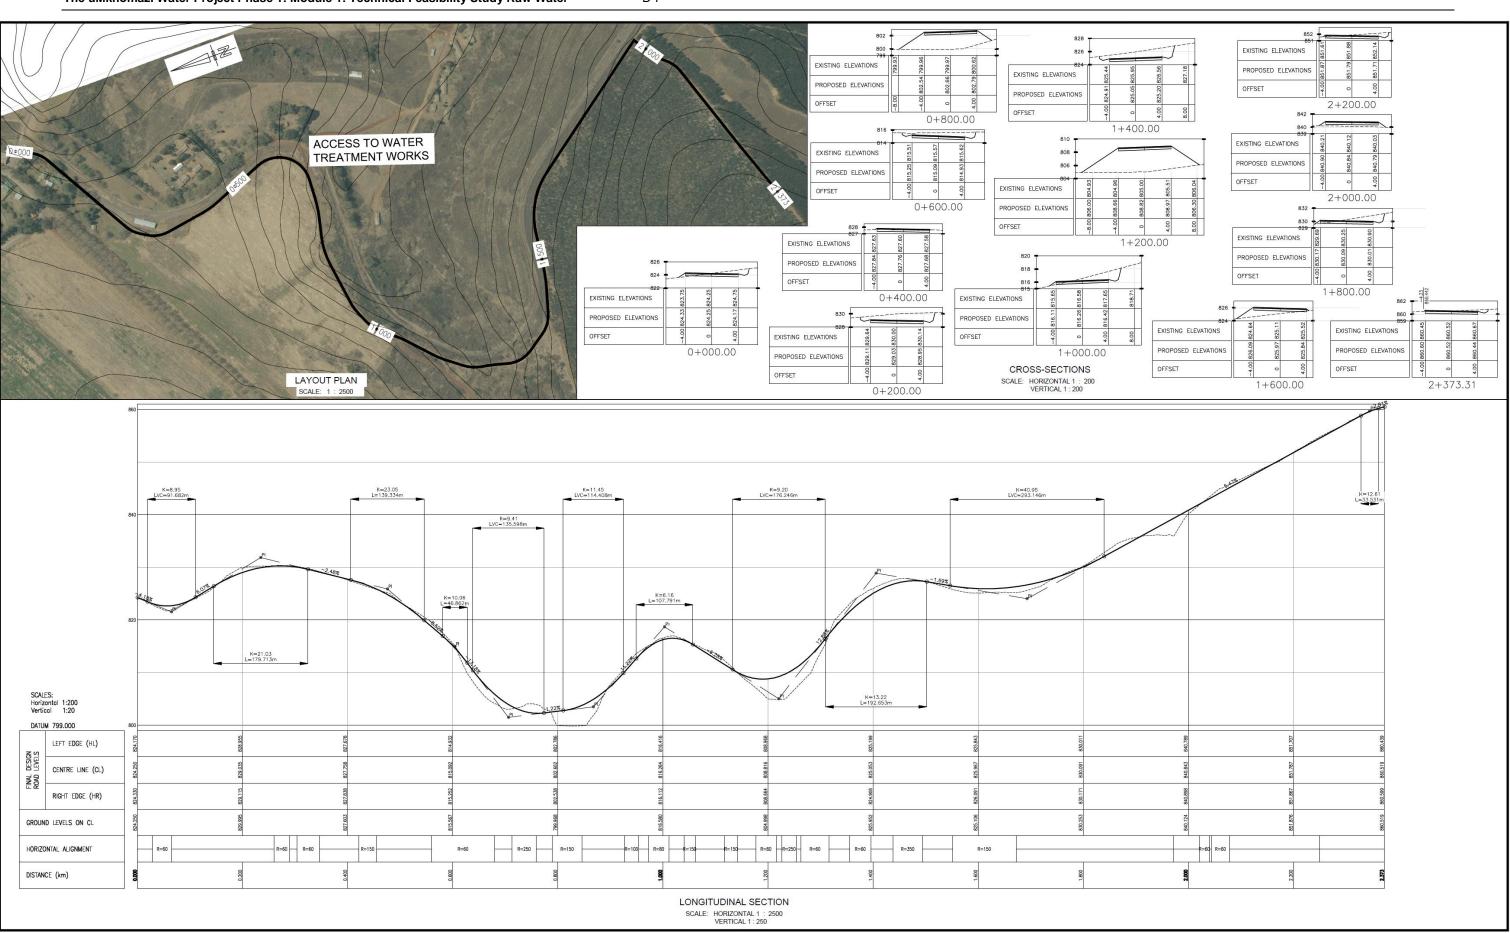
Langa Dam – Layout plan, longitudinal section and cross sections of access road to water treatment works
